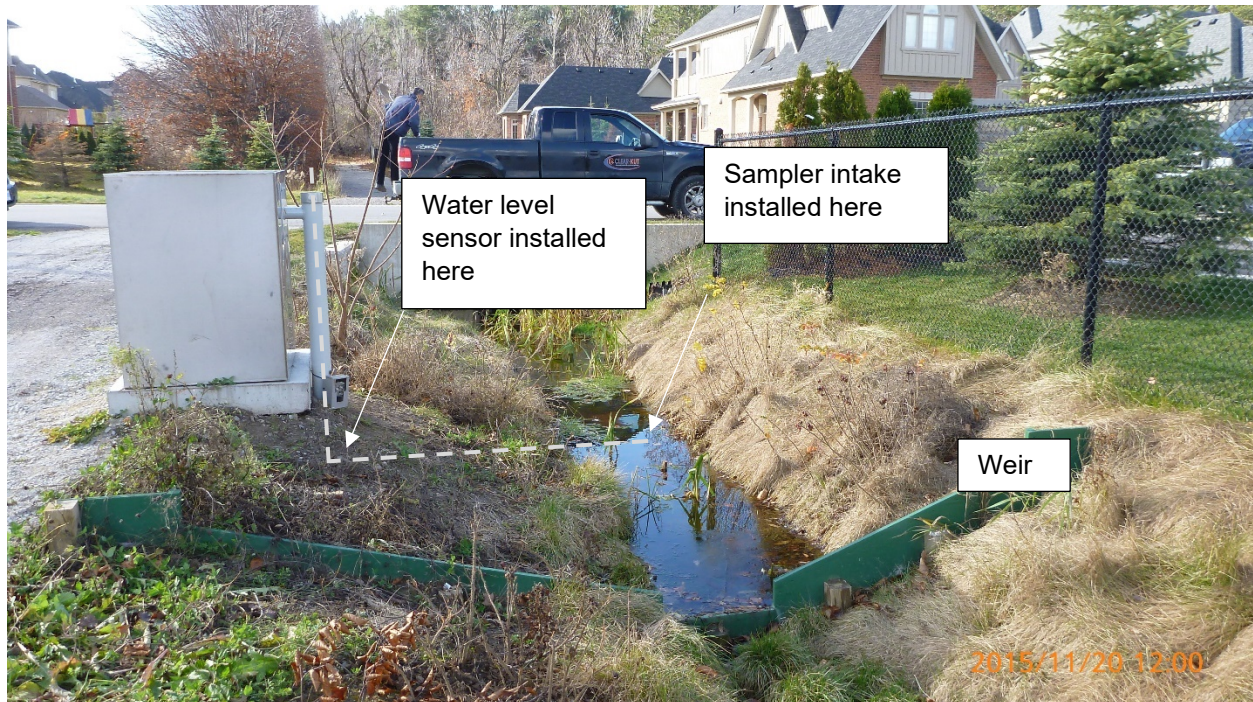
Layout of inlet monitoring station, indicating locations of the weir, and where the water level sensor and sampler intake are installed. Note: that there is an open pipe leading from the swale to the location of the level sensor.
